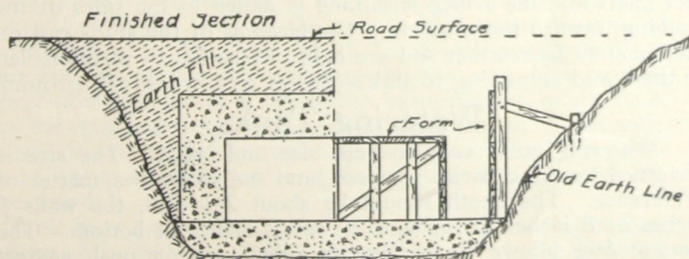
Culvert Shown Half Finished and Half With Form in Place.
